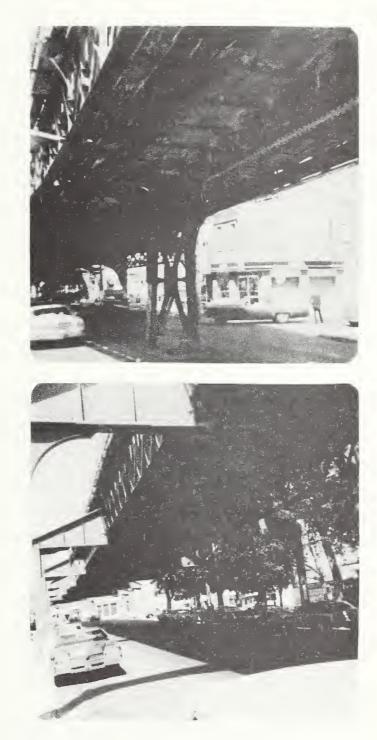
SEPTA FRANKFORD LINE ELEVATED STEEL STRUCTURE
